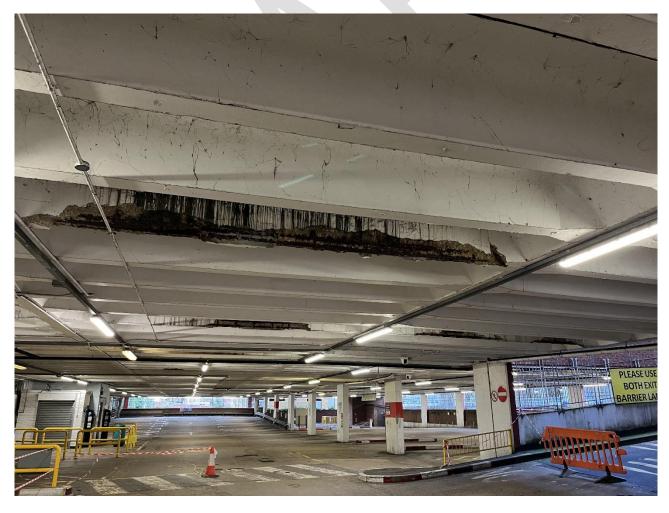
Spalled concrete ribs revealing corroded reinforcement
